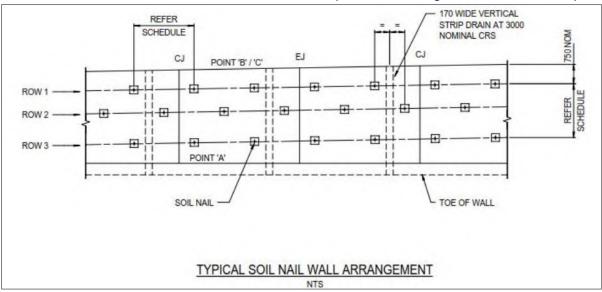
Typical Soil Nail Wall Arrangement (North of Land Bridge)
